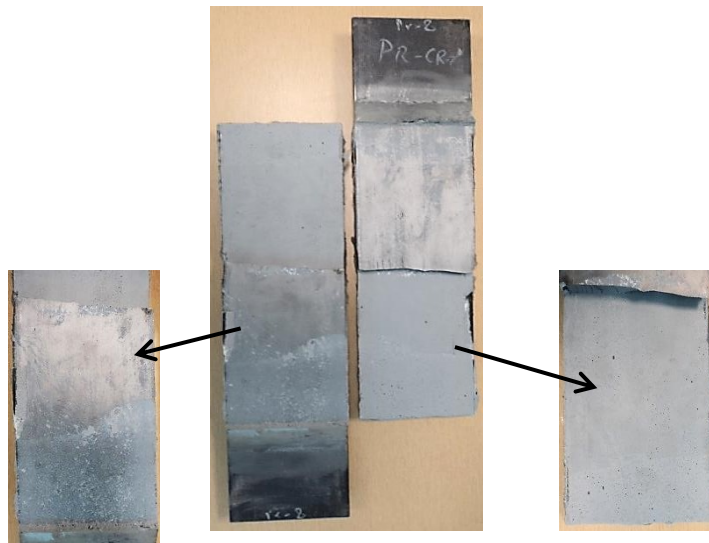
Delaminated CFRP surface and the failed specimen 3-CBDR-Sk-30
